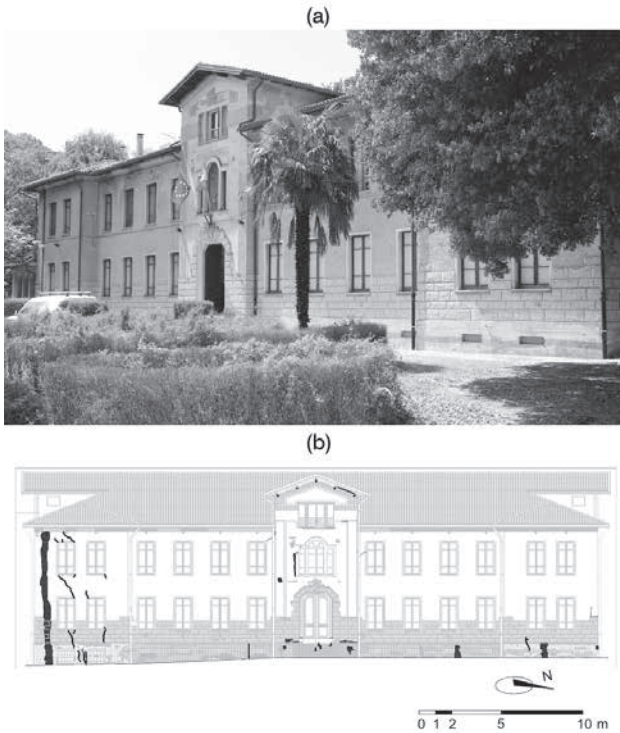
(a) Main building of the research centre under investigation. (b) Front view of the building where cracks in the southern load-bearing walls are marked with black lines.
